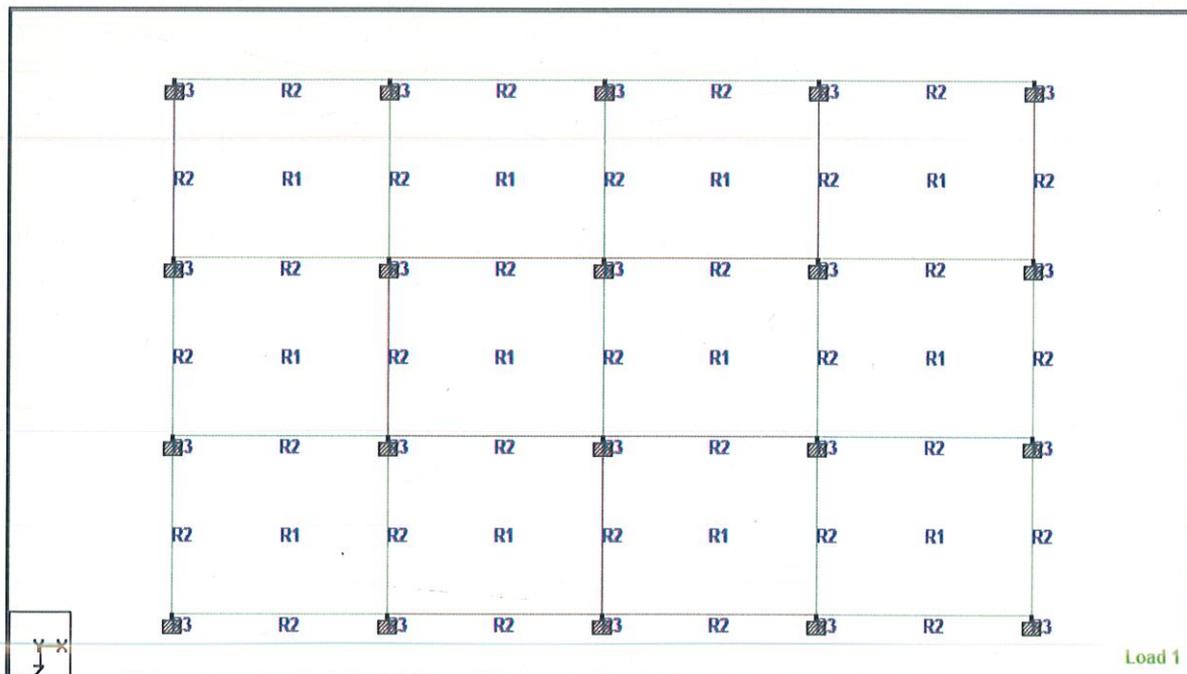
, FLOOR PLAN OF THE BUILDING
